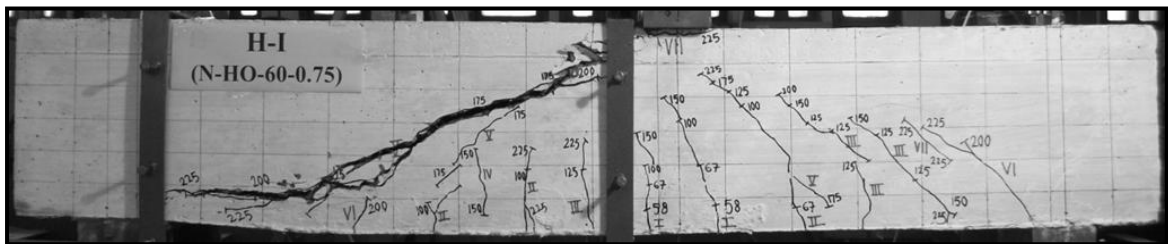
Peak load crack patterns of the normal strength concrete beam specimens reinforced with the hooked-end fibres
